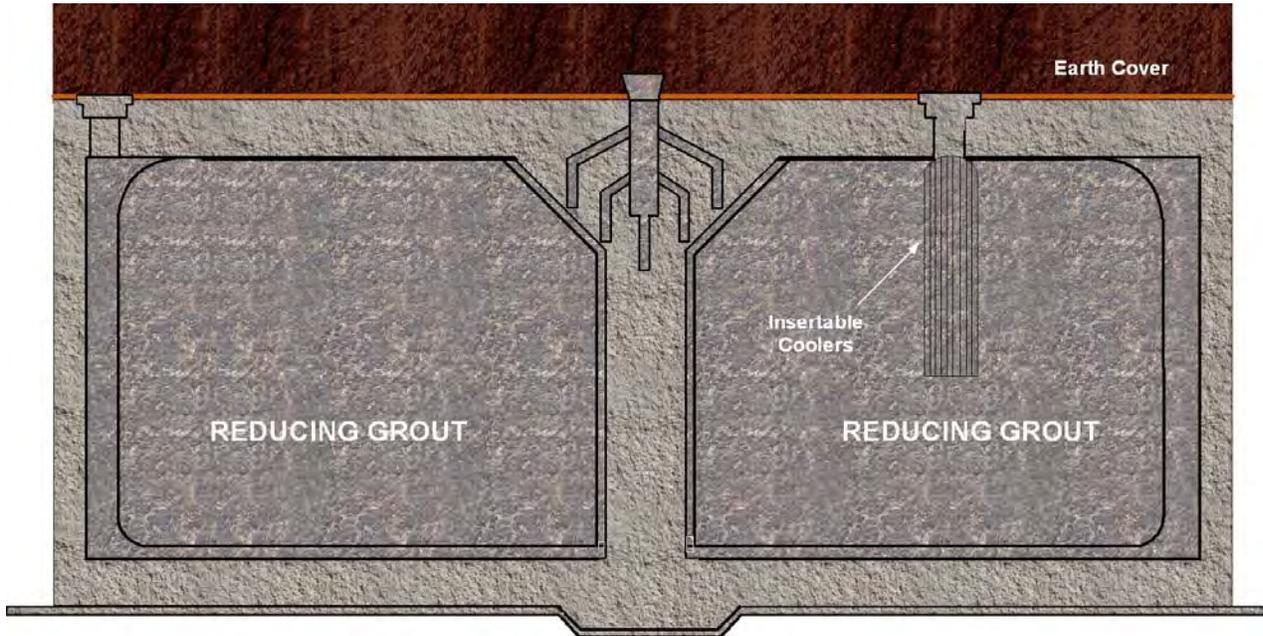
Typical Type IIIA Tank Grouting Configuration
